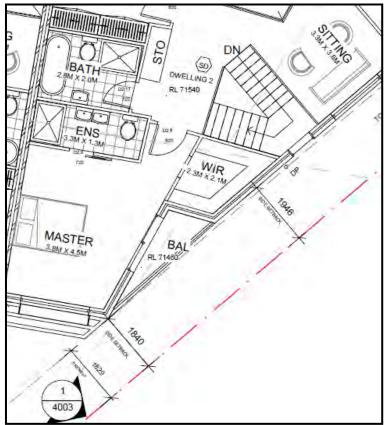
Dwelling 2 – Master bedroom balcony posing overlooking concerns to adjoining site.
